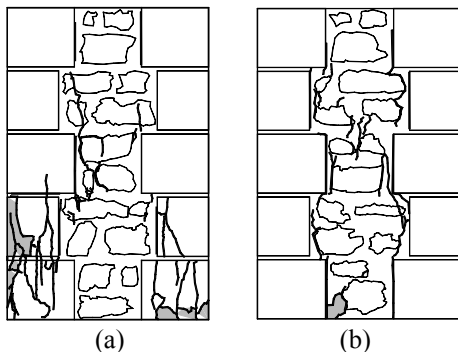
Ultimate failure patterns for the wallets with keyed collar joints: (a) Noto (NO3) and (b) Serena (SO3).
